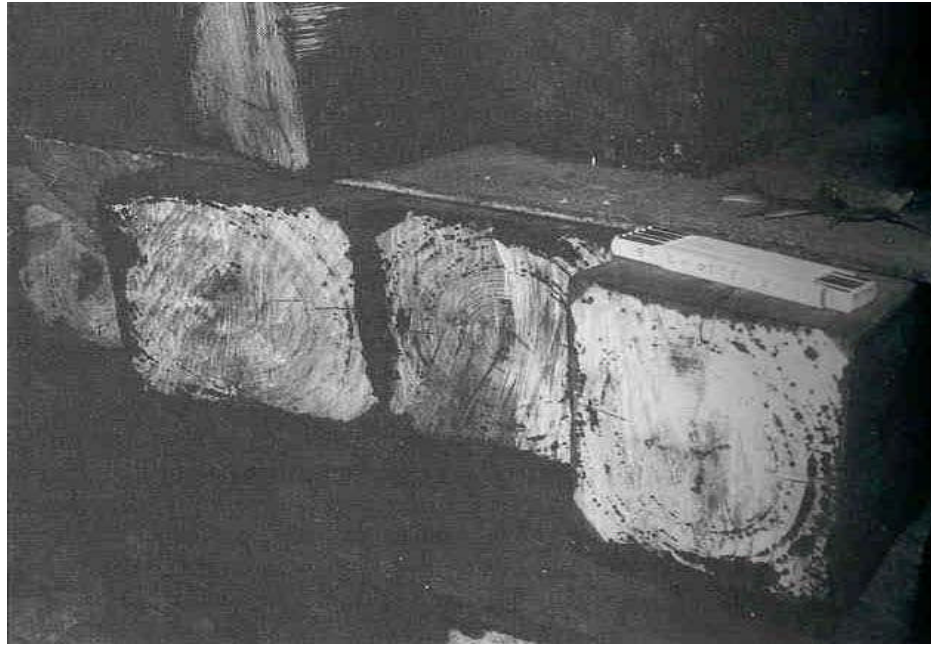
Bridge Timber Member Showing Penetration Depth of Preservative Treatment
